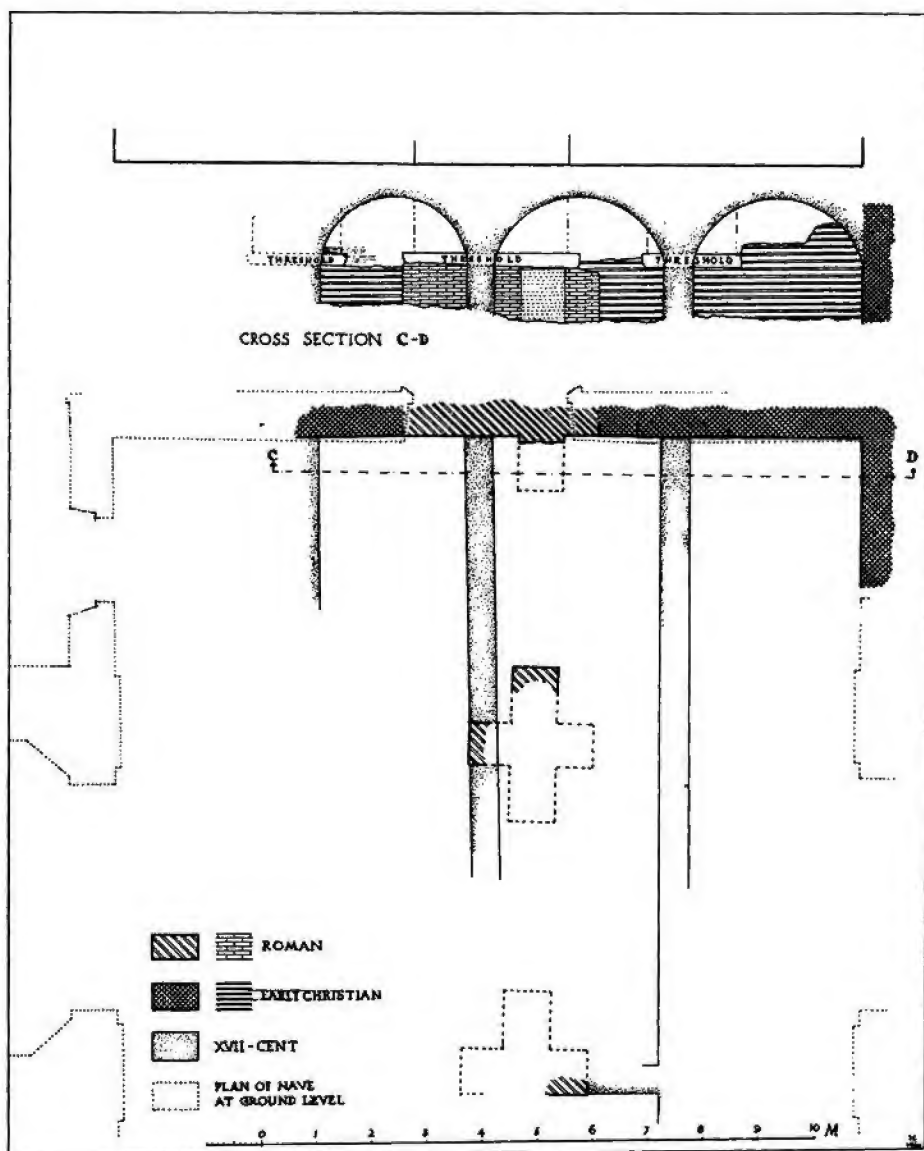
S. Lorenzo in Lucina. Plan and cross section of vaults below nave floor, north end.
